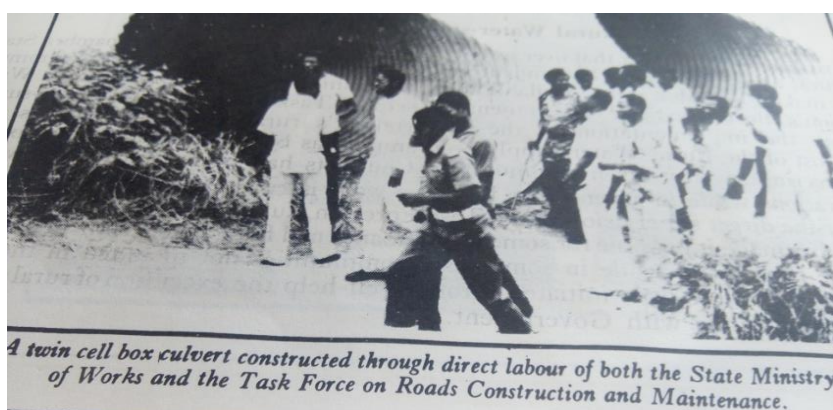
The Governor, Group Captain Sampson EmekaOmeruah and the Chairman, Task Force on Road Construction, Col. Otanigbade, inspecting the Twin cell box culvert constructed through direct labour of both the state Ministry of Works and the Task Force on Roads Construction and Maintenance. Source: ANS, "Development Projects, 1987," 20
